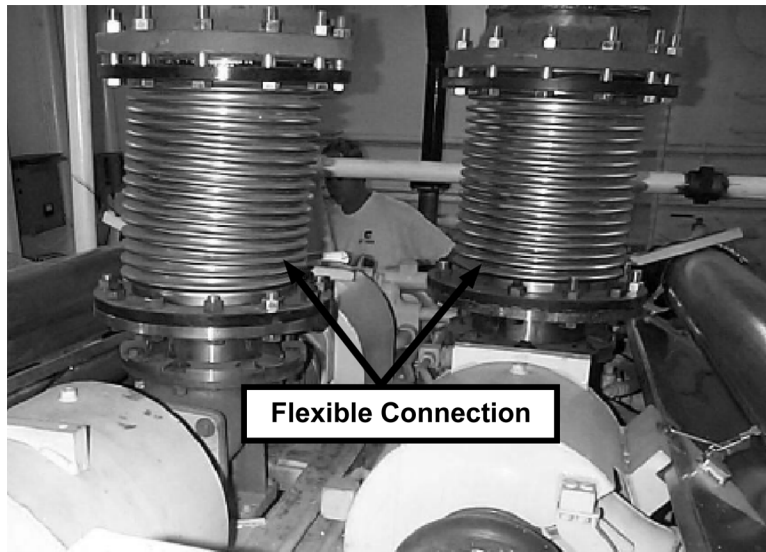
Stainless Steel Bellows – Flexible Connections
